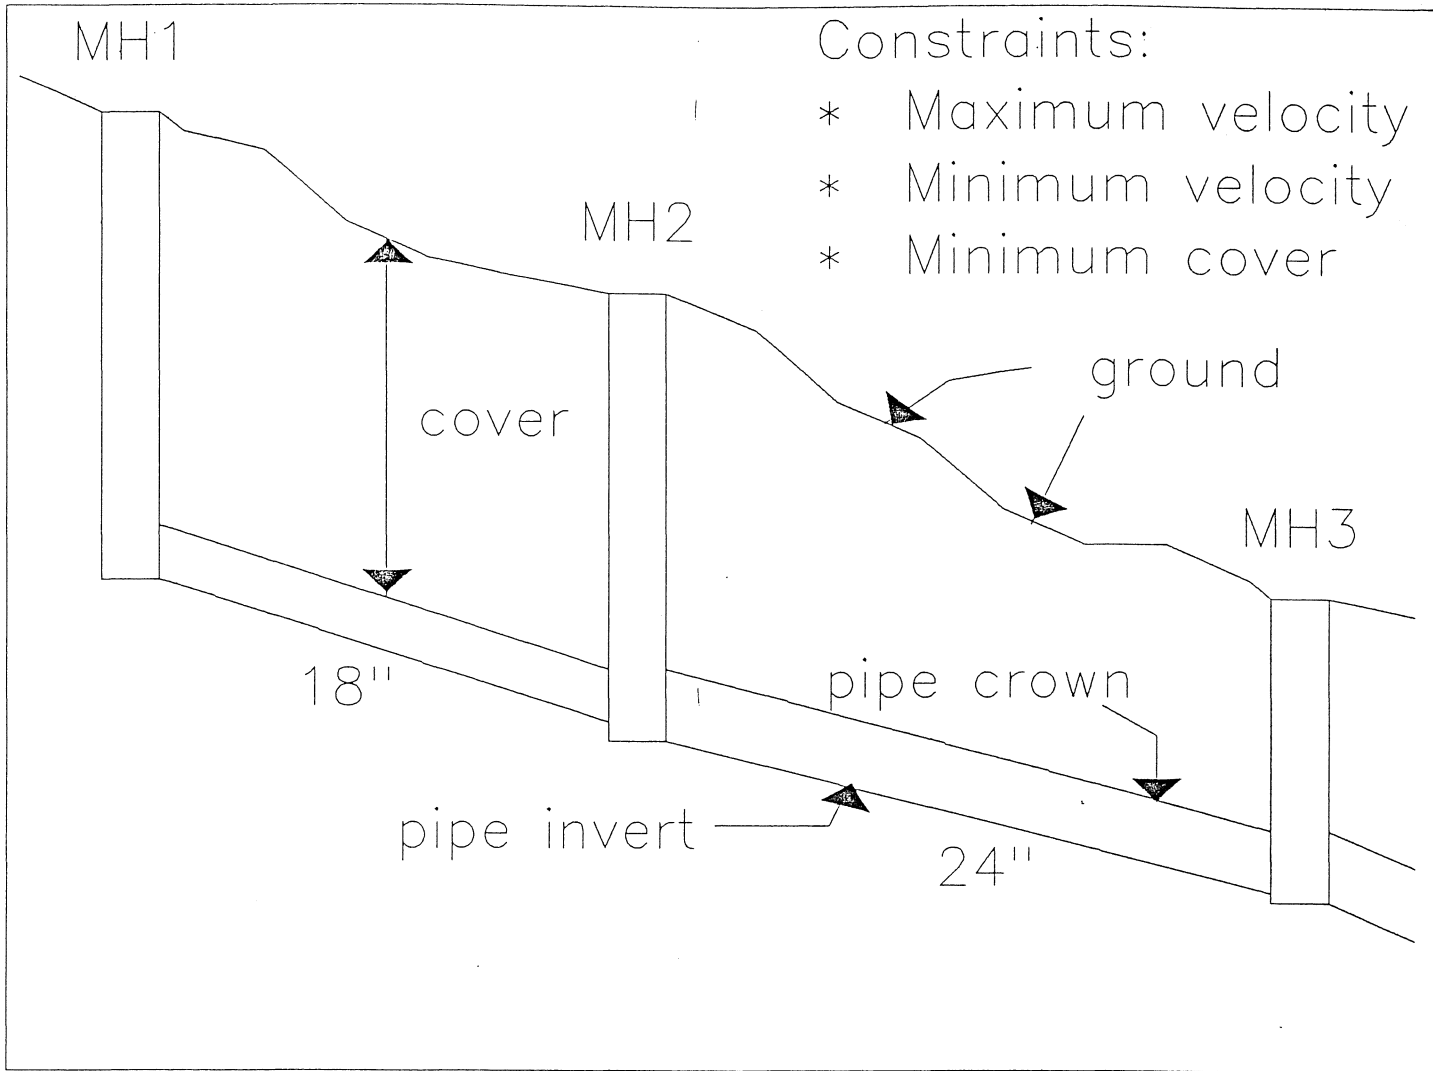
Profile View of Vertical Alignment of Stormwater Drainage System
